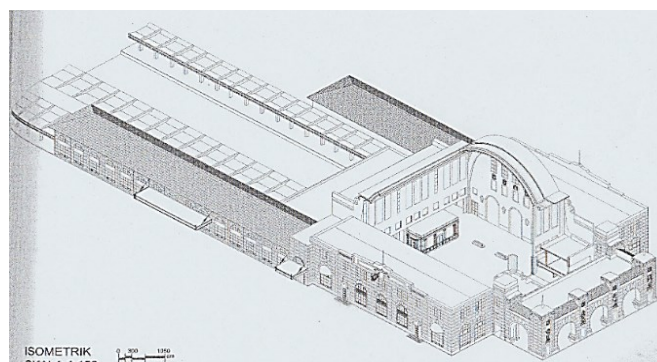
The Tanjong Pagar Station used head house plan type having U-shaped plan (KALAM, 2008).
